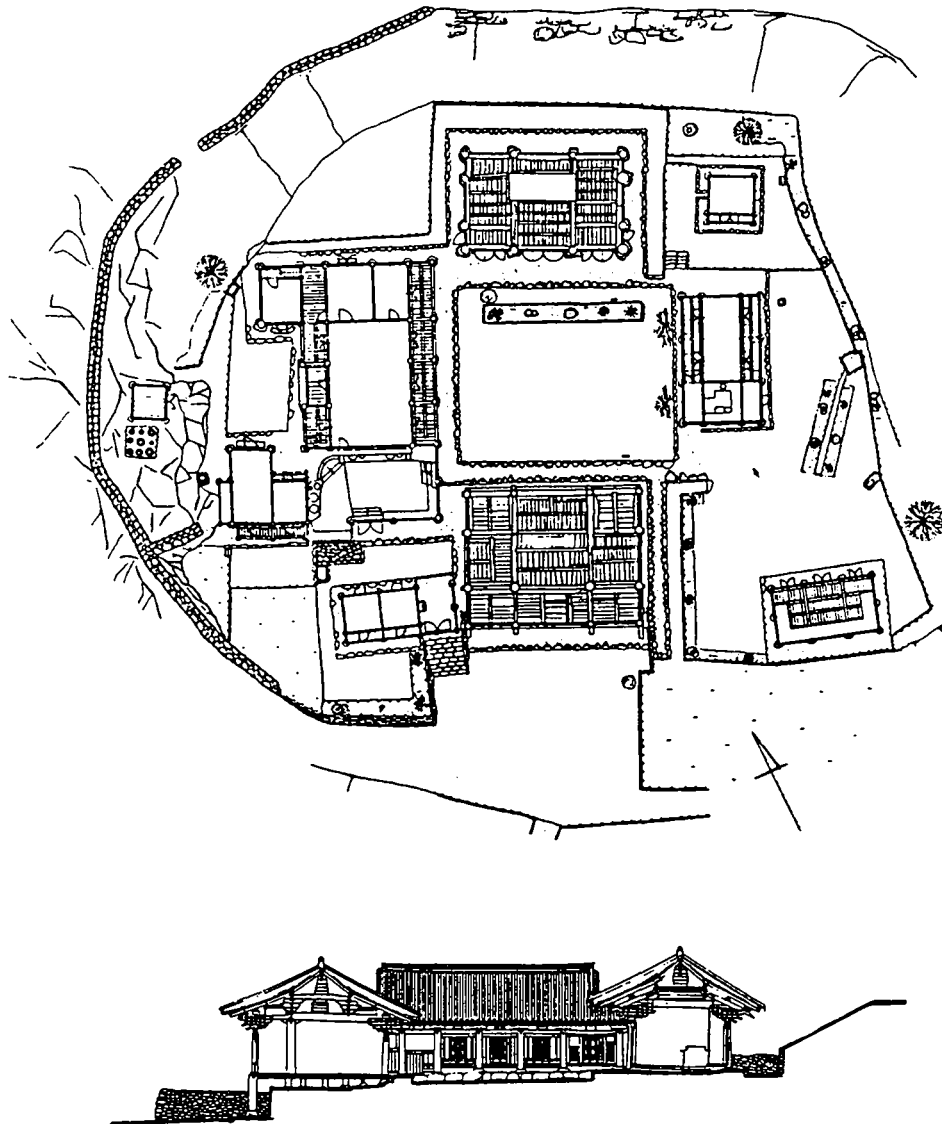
Layout plan and section of Hwa-am-sa 花嚴寺 화암사 (No. 5.7.1.)
